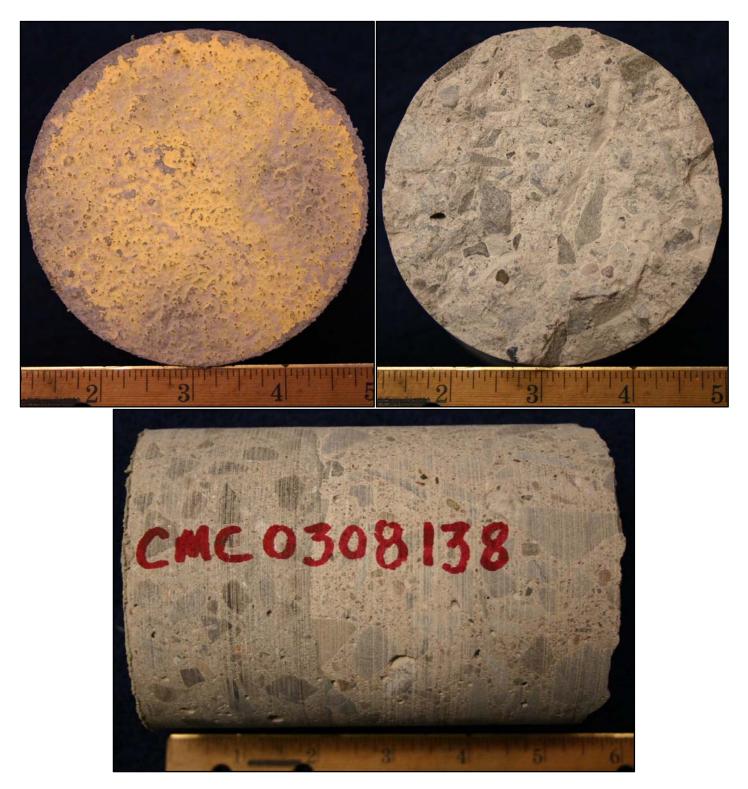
Shown are: (a) the top surface with waterproofing membrane, (top left photo); (b) the bottom fresh fractured surface (top right photo), and (c) side view (bottom photo) of the core as received.
